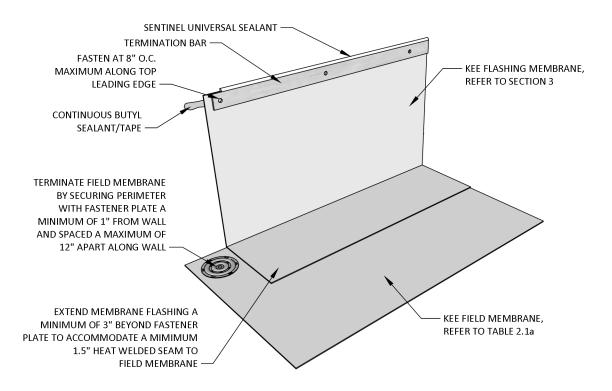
Adhered KEE Field Membrane at Wall/Curb with Horizontal Perimeter Fastening
